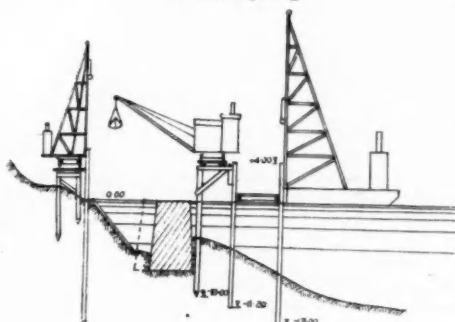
Outer cofferdam completed, demolition of the old wall proceeding.
